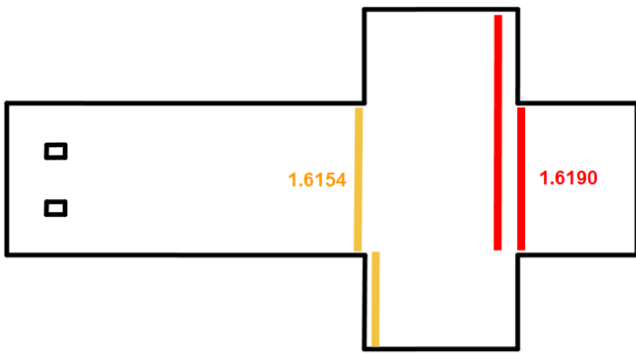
Golden ratio found on the floor plan of Sta. Barbara Church
